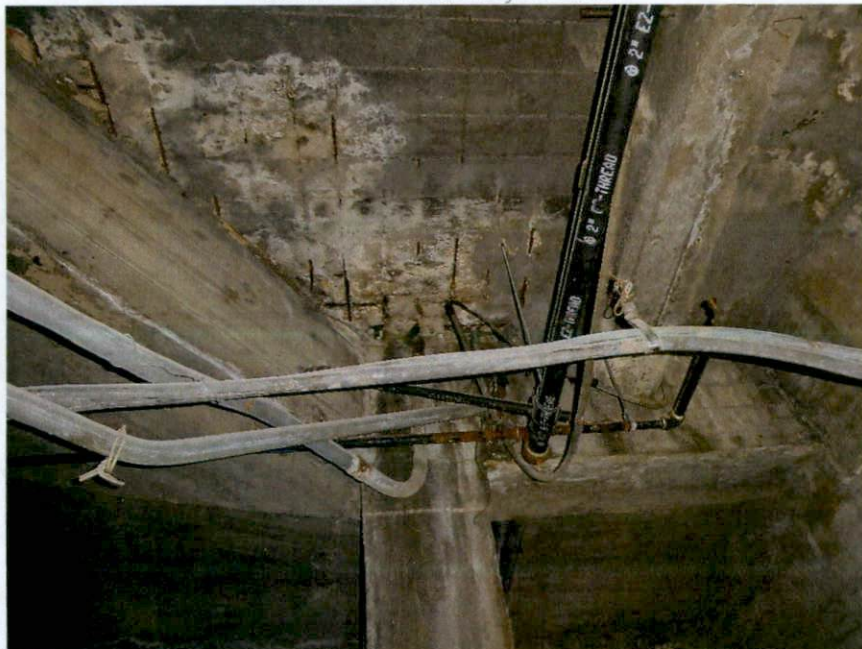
Photo EE: View of cracked concrete and efflorescence stains at basement level under sidewalk.
